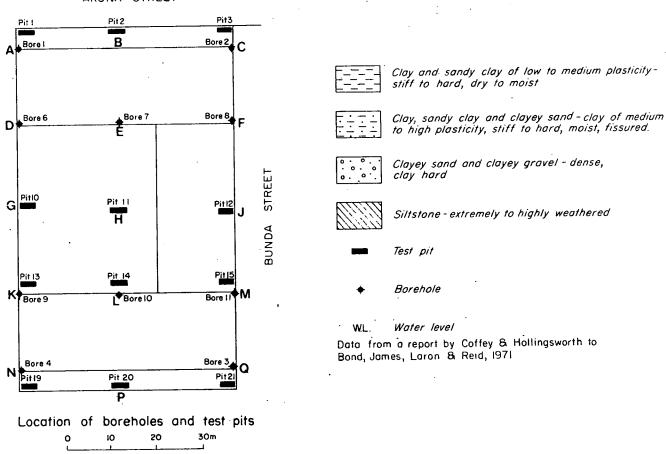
FOUNDATION EXPLORATION FOR CAGA BUILDING, CANBERRA.
